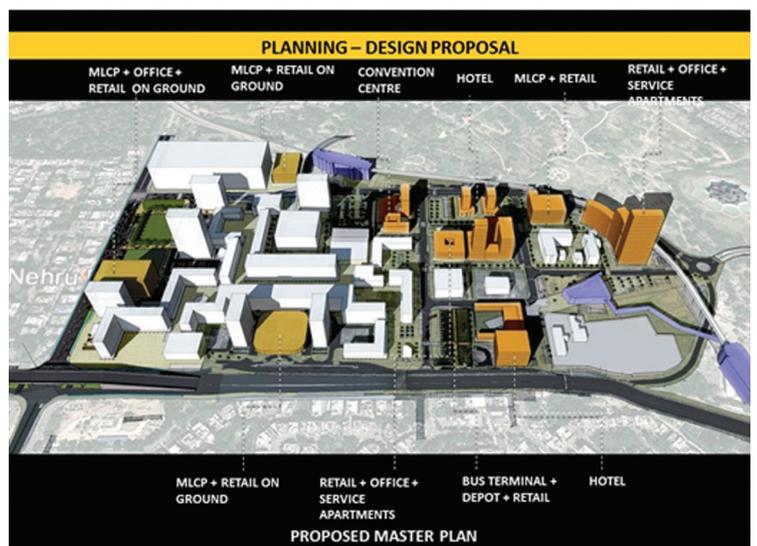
Nehru Place Proposed plan – Three dimensional representation
